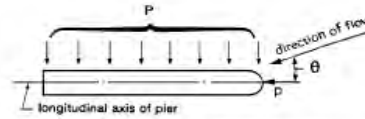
Plan View of Pier Showing Stream Flow Pressure
